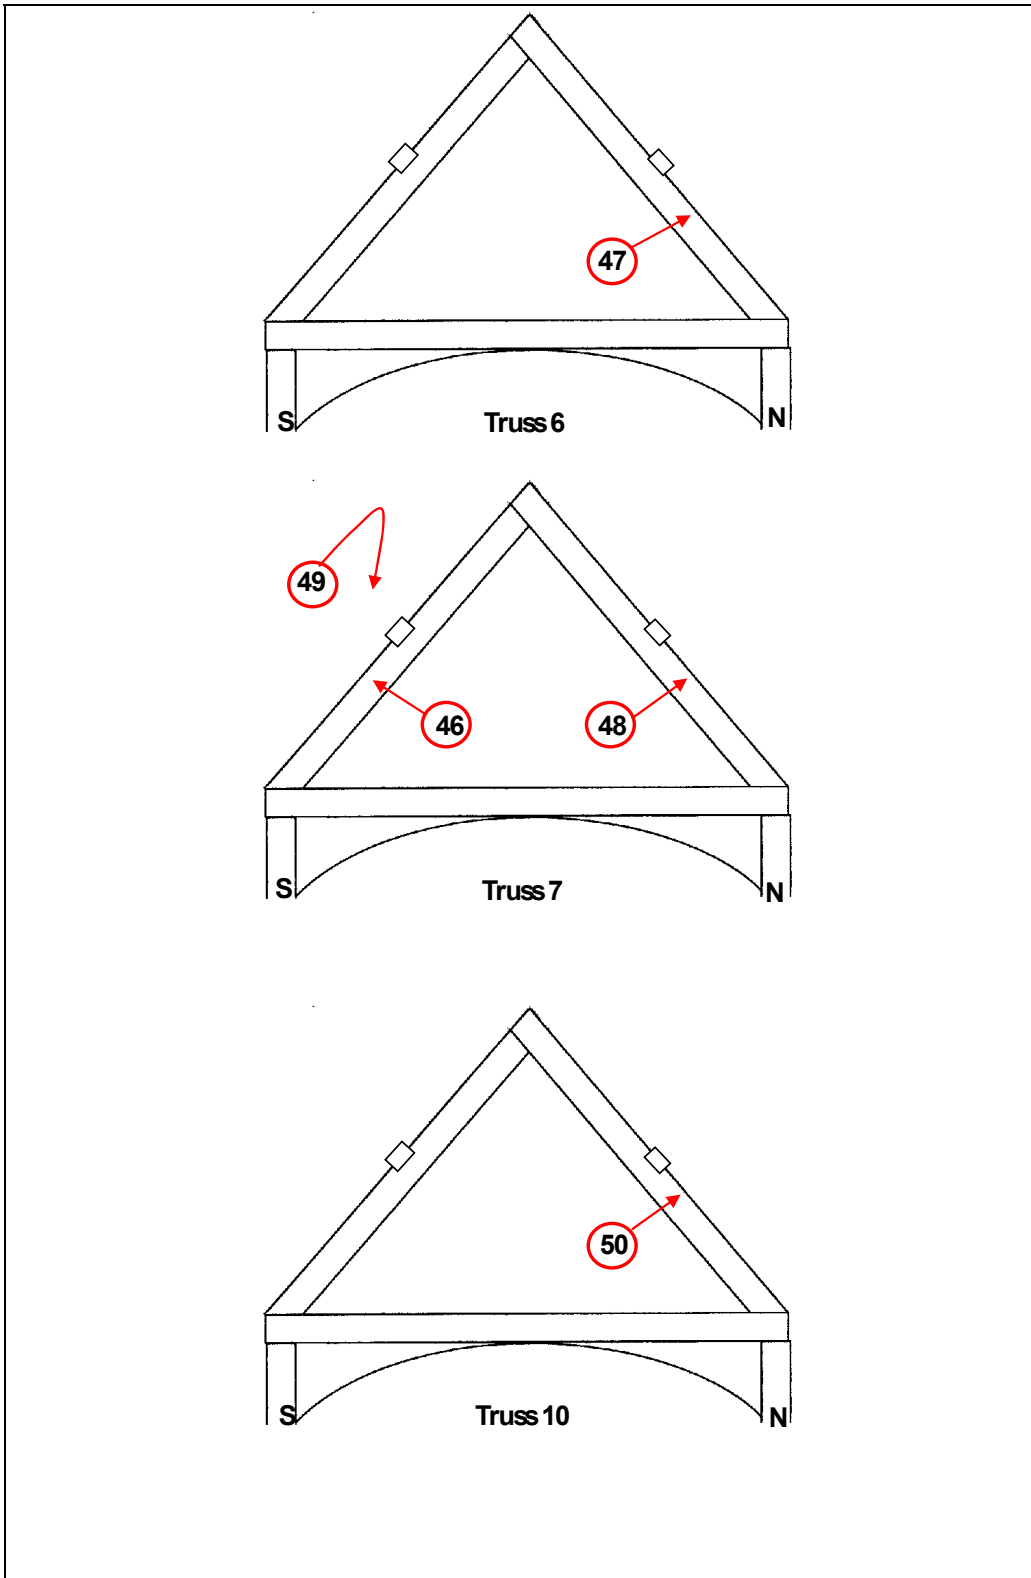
Trusses 6–10 of the south aisle roof to show sampled timbers
